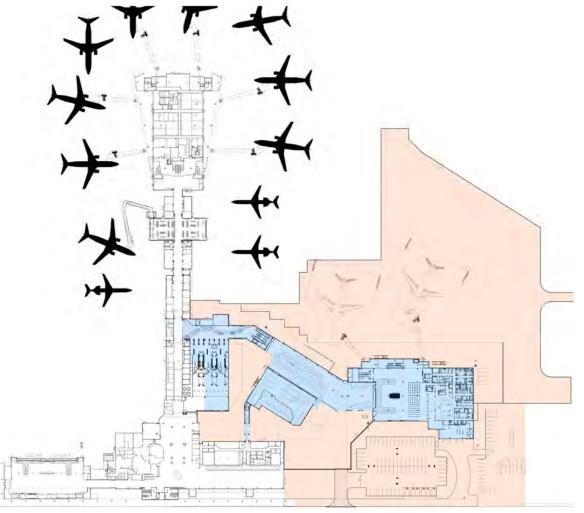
| Terminal Building and the Terminal/FIS Expansion Project
